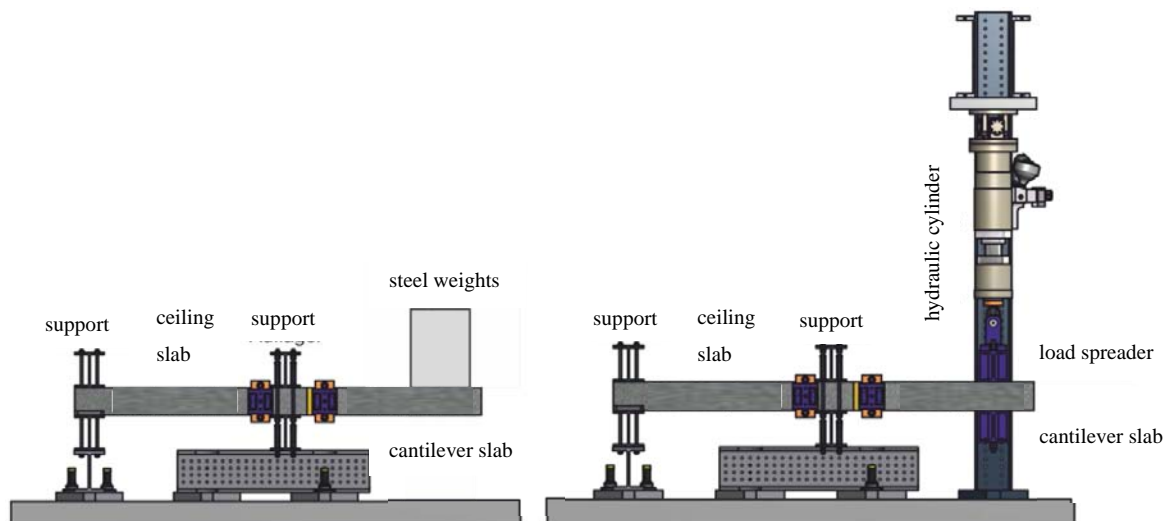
Sections arrangement of test setup (horizontal and vertical)
